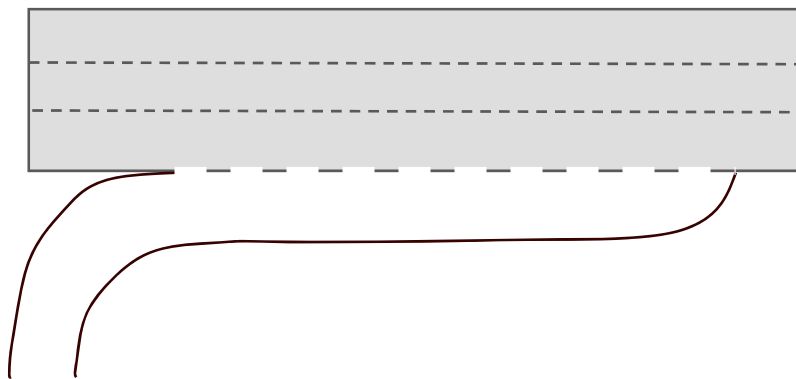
Road Section with long entry/exit slip road on highway crossings
